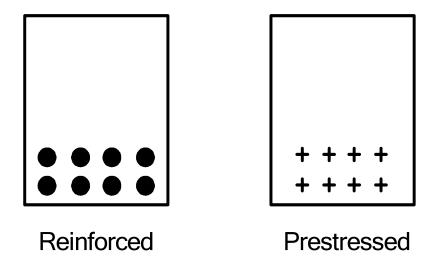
Mild Steel Reinforced Concrete vs. Precast Prestressed Concrete
